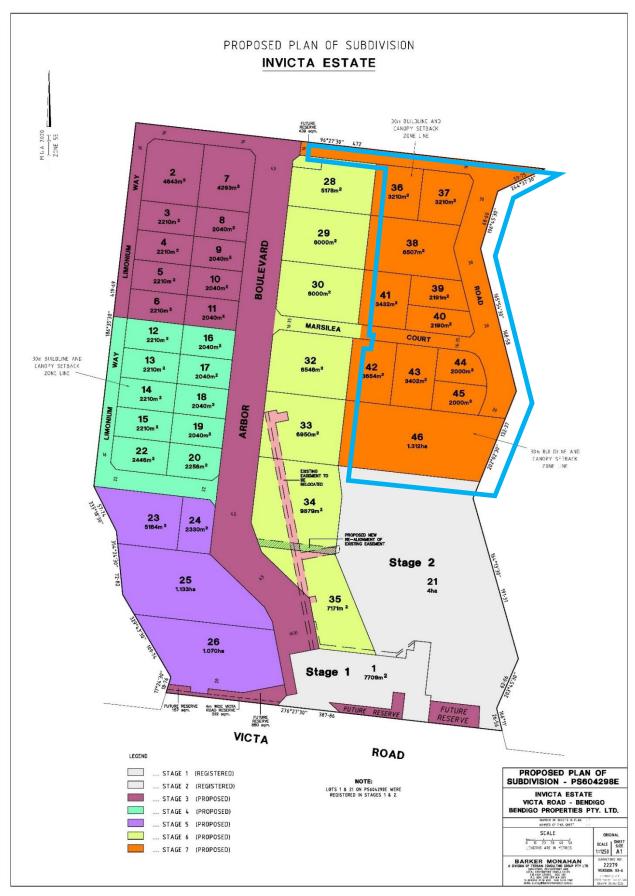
Proposed plan of subdivision – the subject area is outlined in blue.
